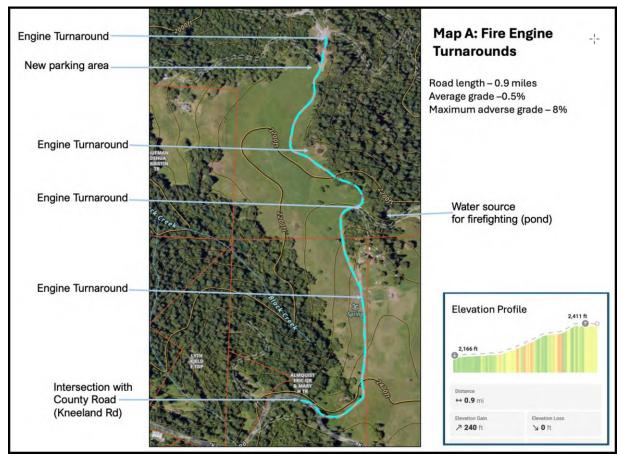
Private access road with fire engine turnarounds, Refer to Appendixs D and J for details.
